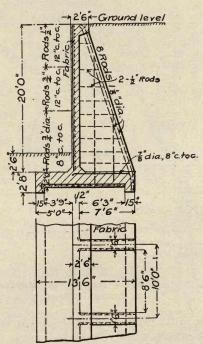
Plan and Section of Wall, Showing Reinforcement.
